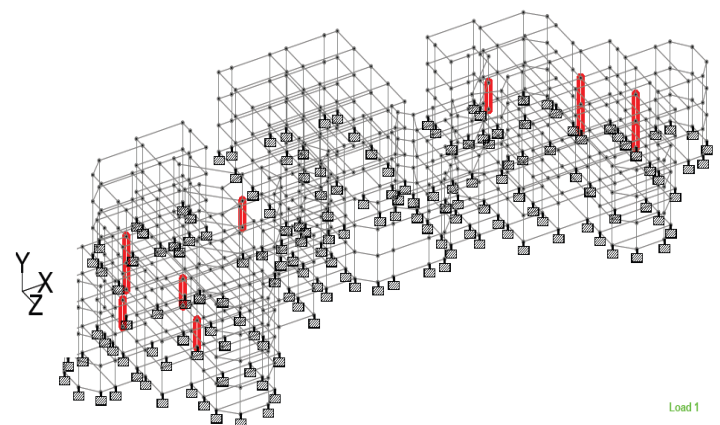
Highlight of columns for which reinforcement % exceeds maximum limit.
